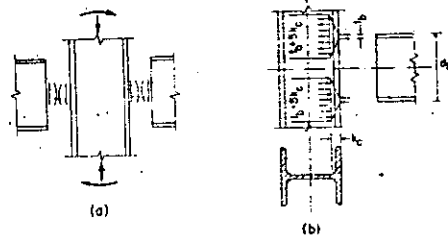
FORCES ON BEAM-TO-COLUMN CONNECTIONS
